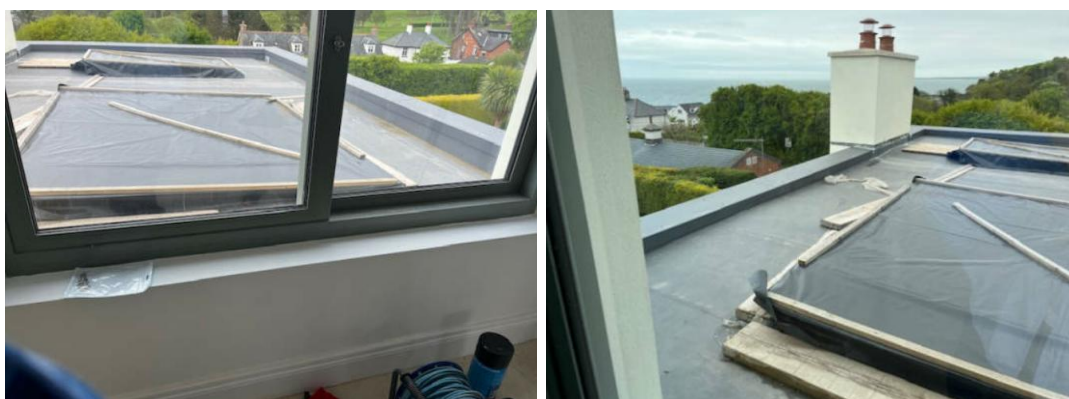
&2 - No view from window towards rooms or private amenity space of No. 4 Sheridan Grove
